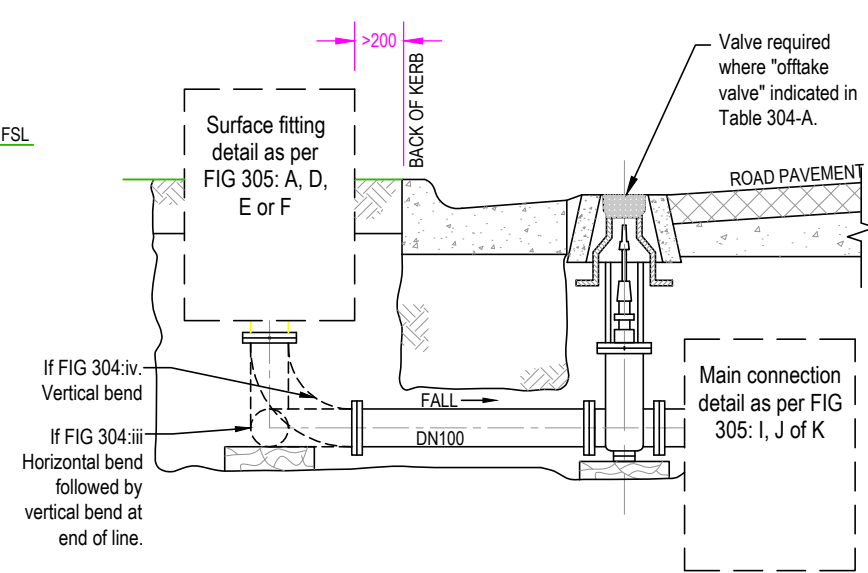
ii: SECTION VIEW. TYPICAL OFFSET ARRANGEMENTS
